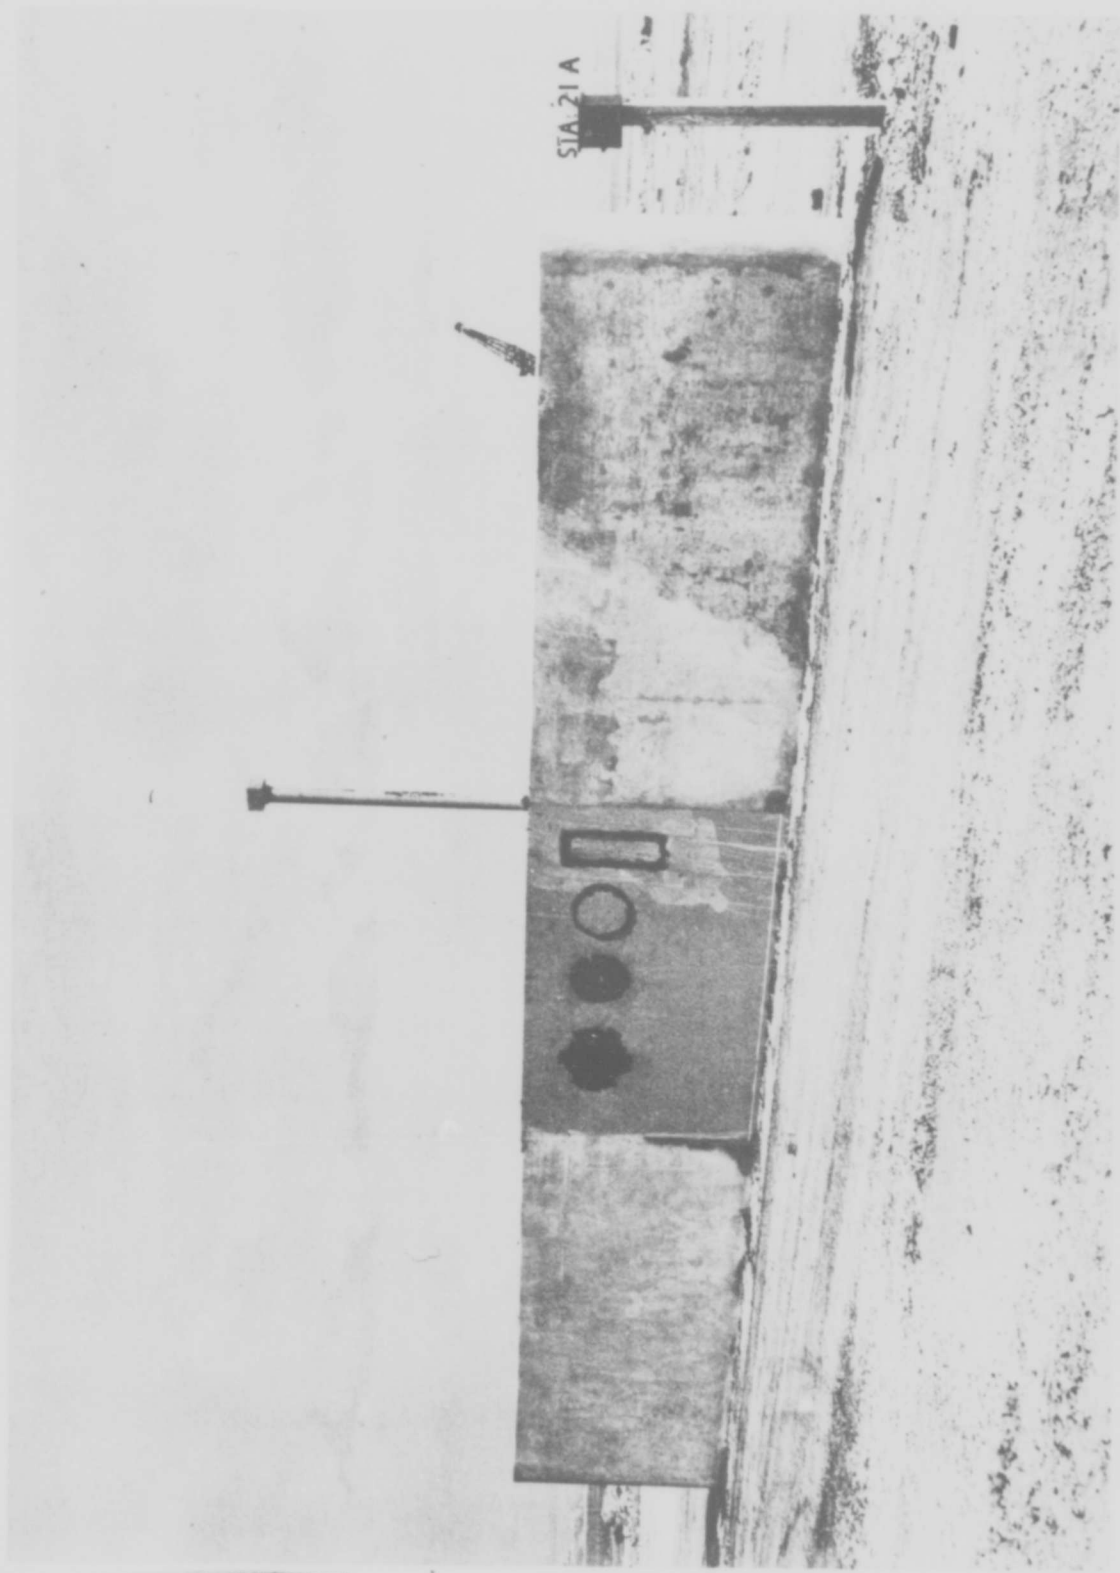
Test Easy, Station 21a; Side View of Wall
